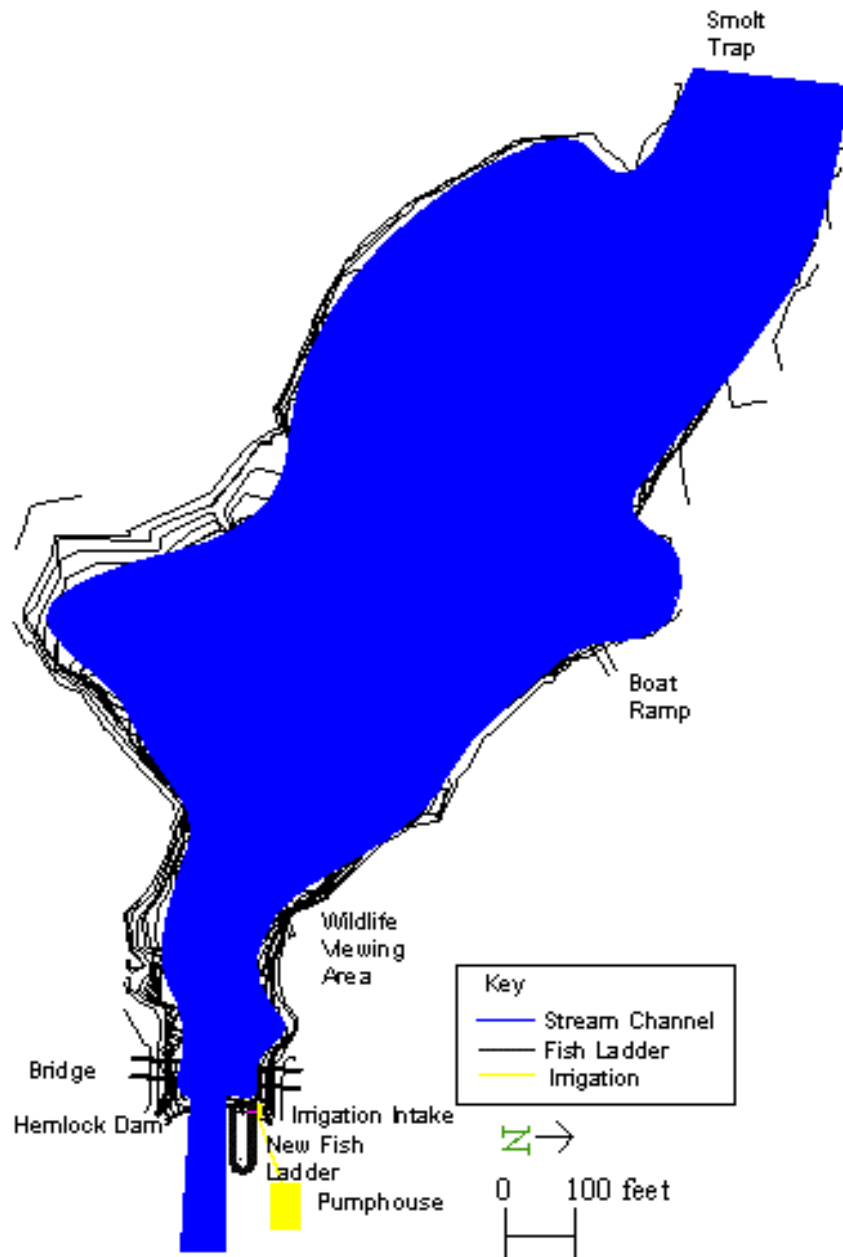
Figure E. Conceptual drawing of Option 4 – Upgrade existing facility proposes to redesigns the fish ladder and irrigation wastewater system and to dredge the reservoir at Hemlock Dam Trout Creek at Hemlock Dam, Skamania County, Washington.
